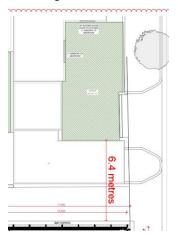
Mark-up of proposed roof terrace plan showing setbacks of development from private open space at No. 10 Gold Street
